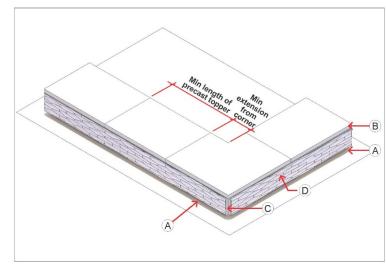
A: Seat wall type 2 axonometric view - corner condition
